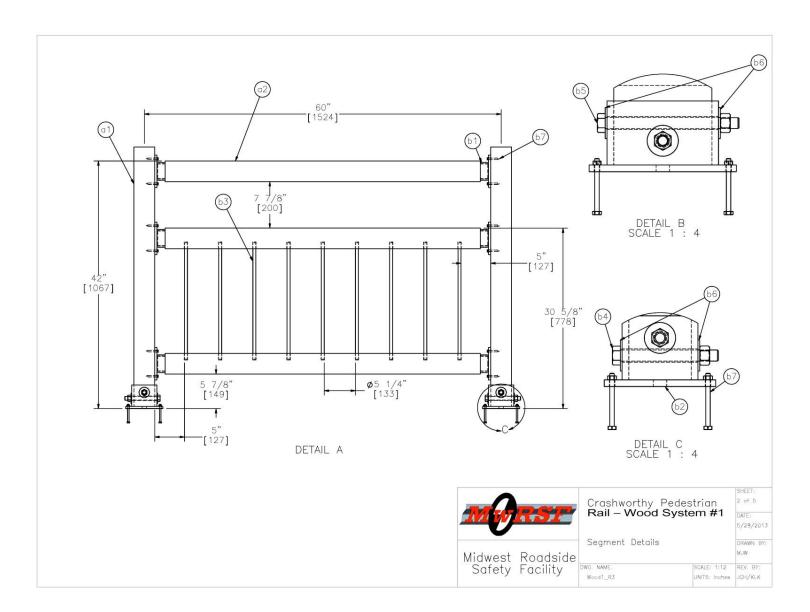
Modular Wood Rail, Design Concept WOOD1 (Sheet 2 of 5)
